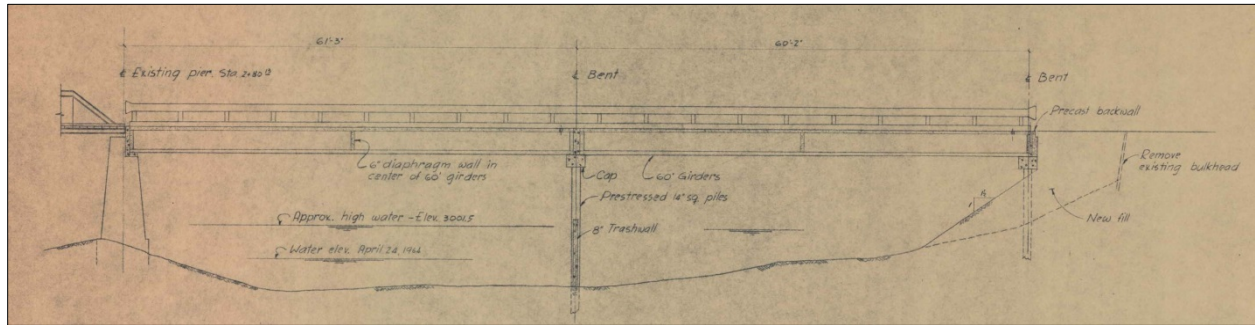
1964 plans of new approach span. The existing pier and relocated 1953 section of the bridge are to the left.
